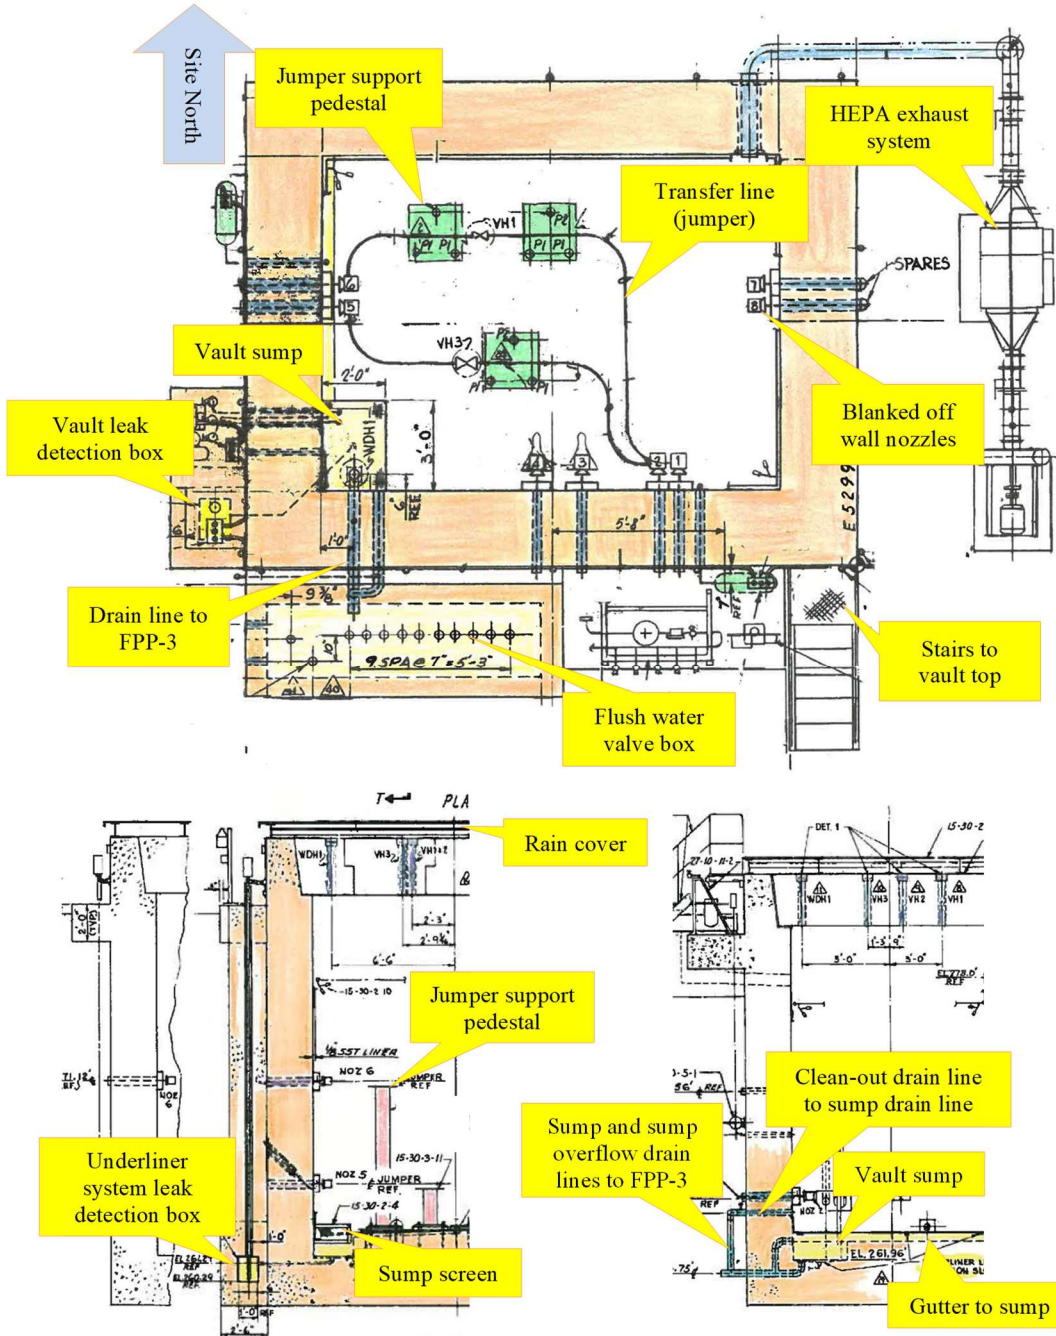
Plan View of FDB-6 and Cross-sections of the Vault Sump and Underliner Drain System
